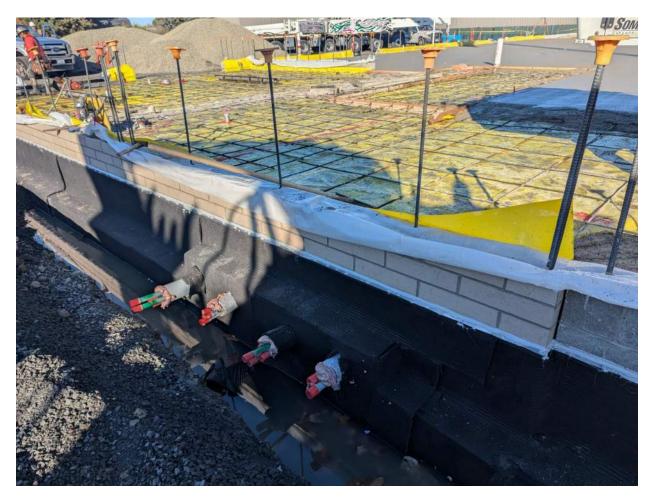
Concrete slab pour, below grade waterproofing of utility penetrations
